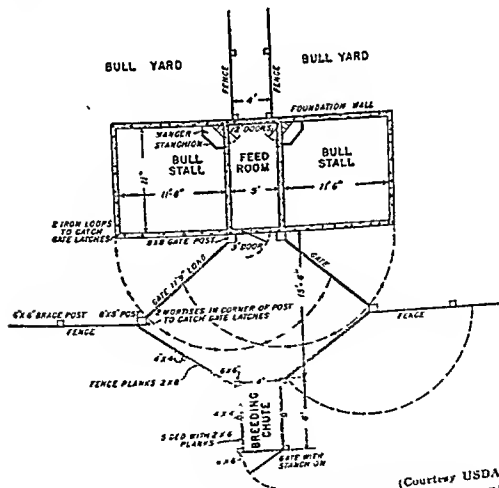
Floor plan for the shed, showing arrangement of breeding chute and system of gates used for the two bulls.
